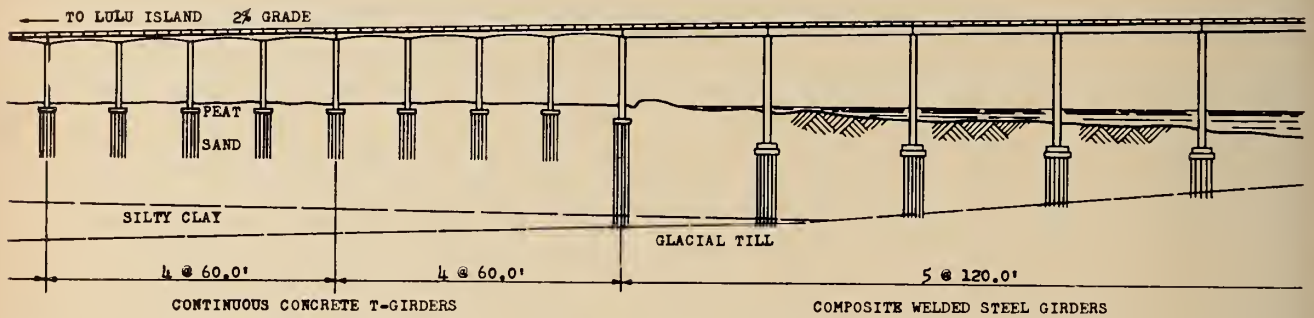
Oak Street bridge profile, showing steel girder spans over the Fraser River and the beginning of the South (above) and North (p. 1821) concrete approaches.
